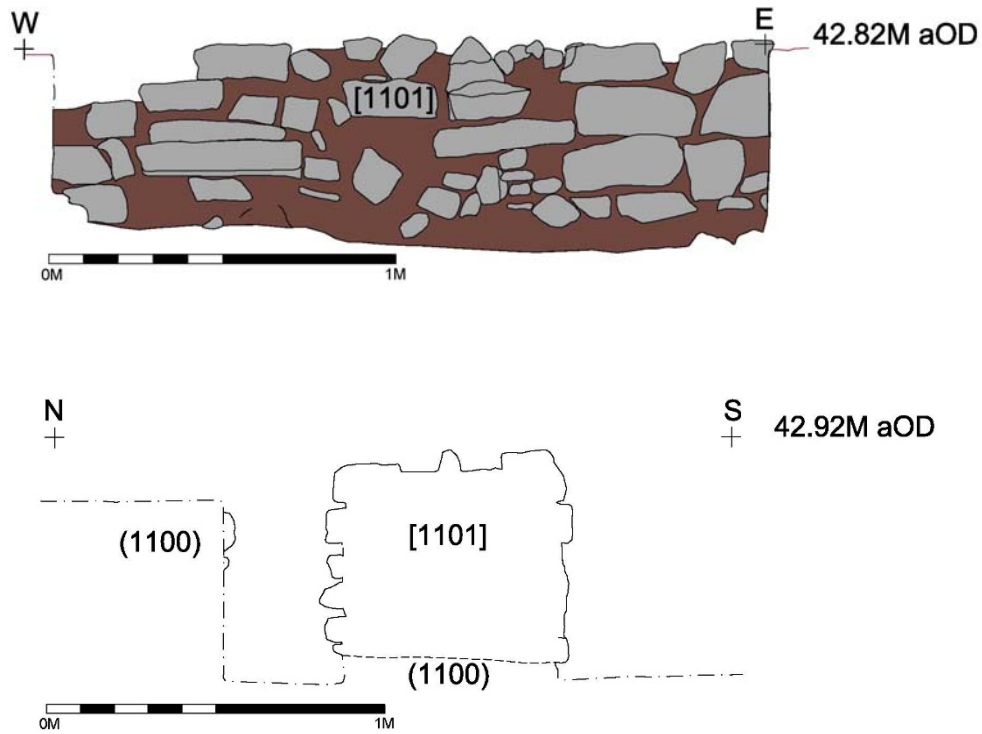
Elevation (top) and profile section (bottom) of wall [1101]
